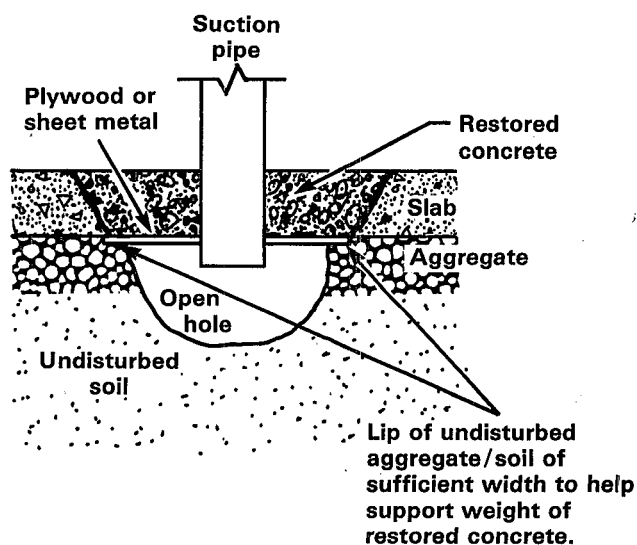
One method for creating open hole under sub-slab suction point when slab hole has been created by jackhammer.
